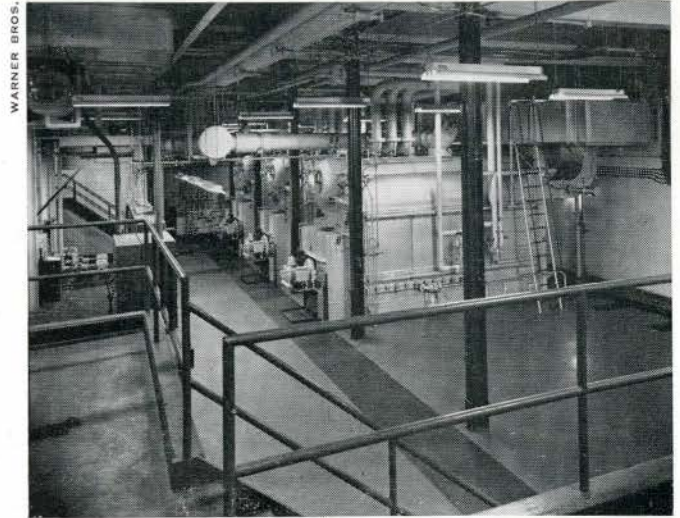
View of boiler room, showing the three boilers and their oil burners. The end of the boiler panel may be seen at the left.
